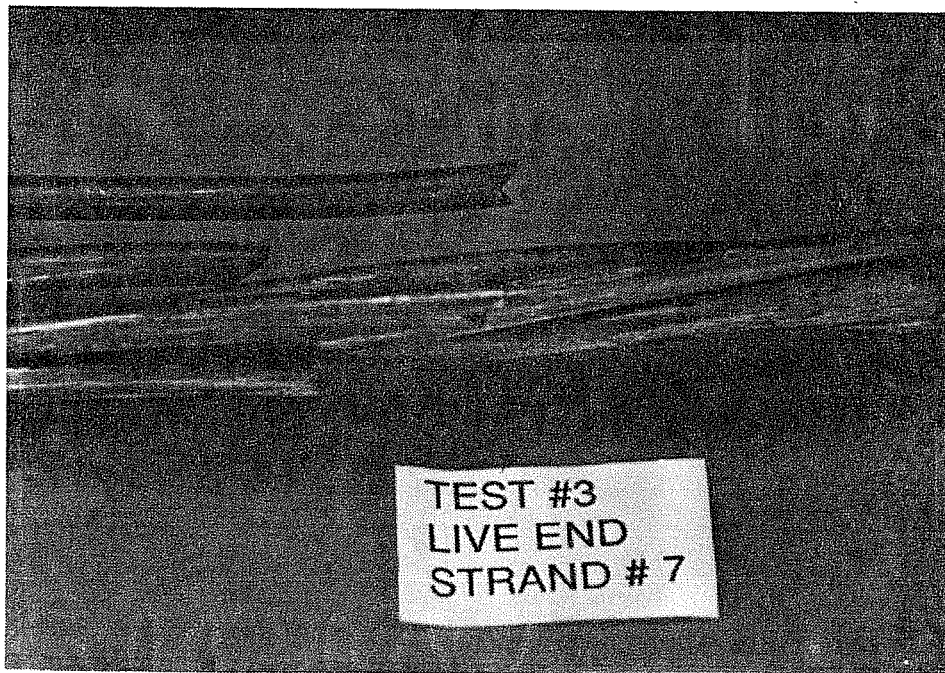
Example of Test #3 fracture surfaces.
